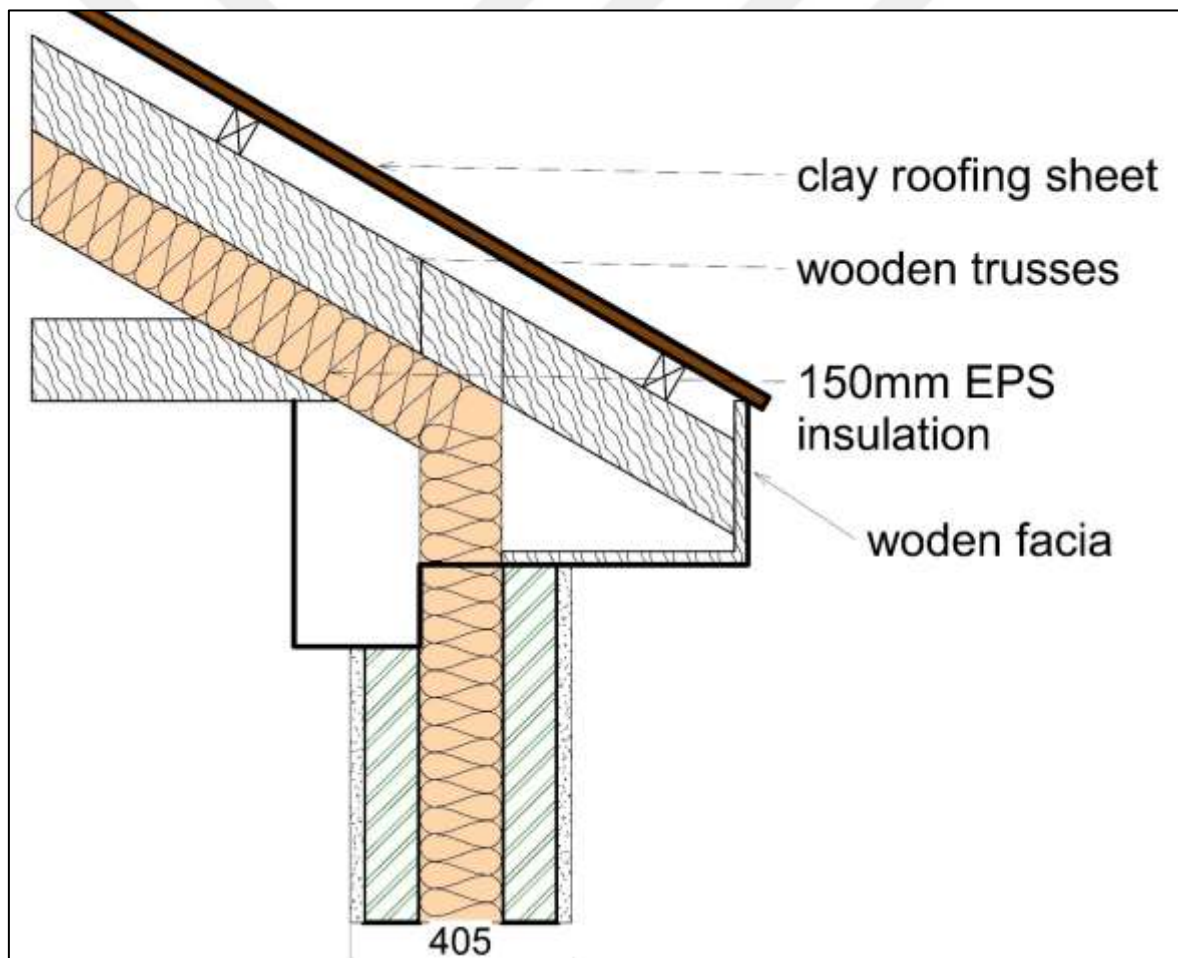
Improved Roof Cross Section (Authors Sketch; Revit).
